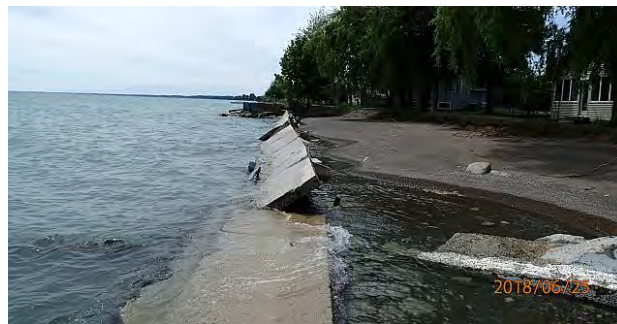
Failed Concrete Wall, Erie Shore Drive
